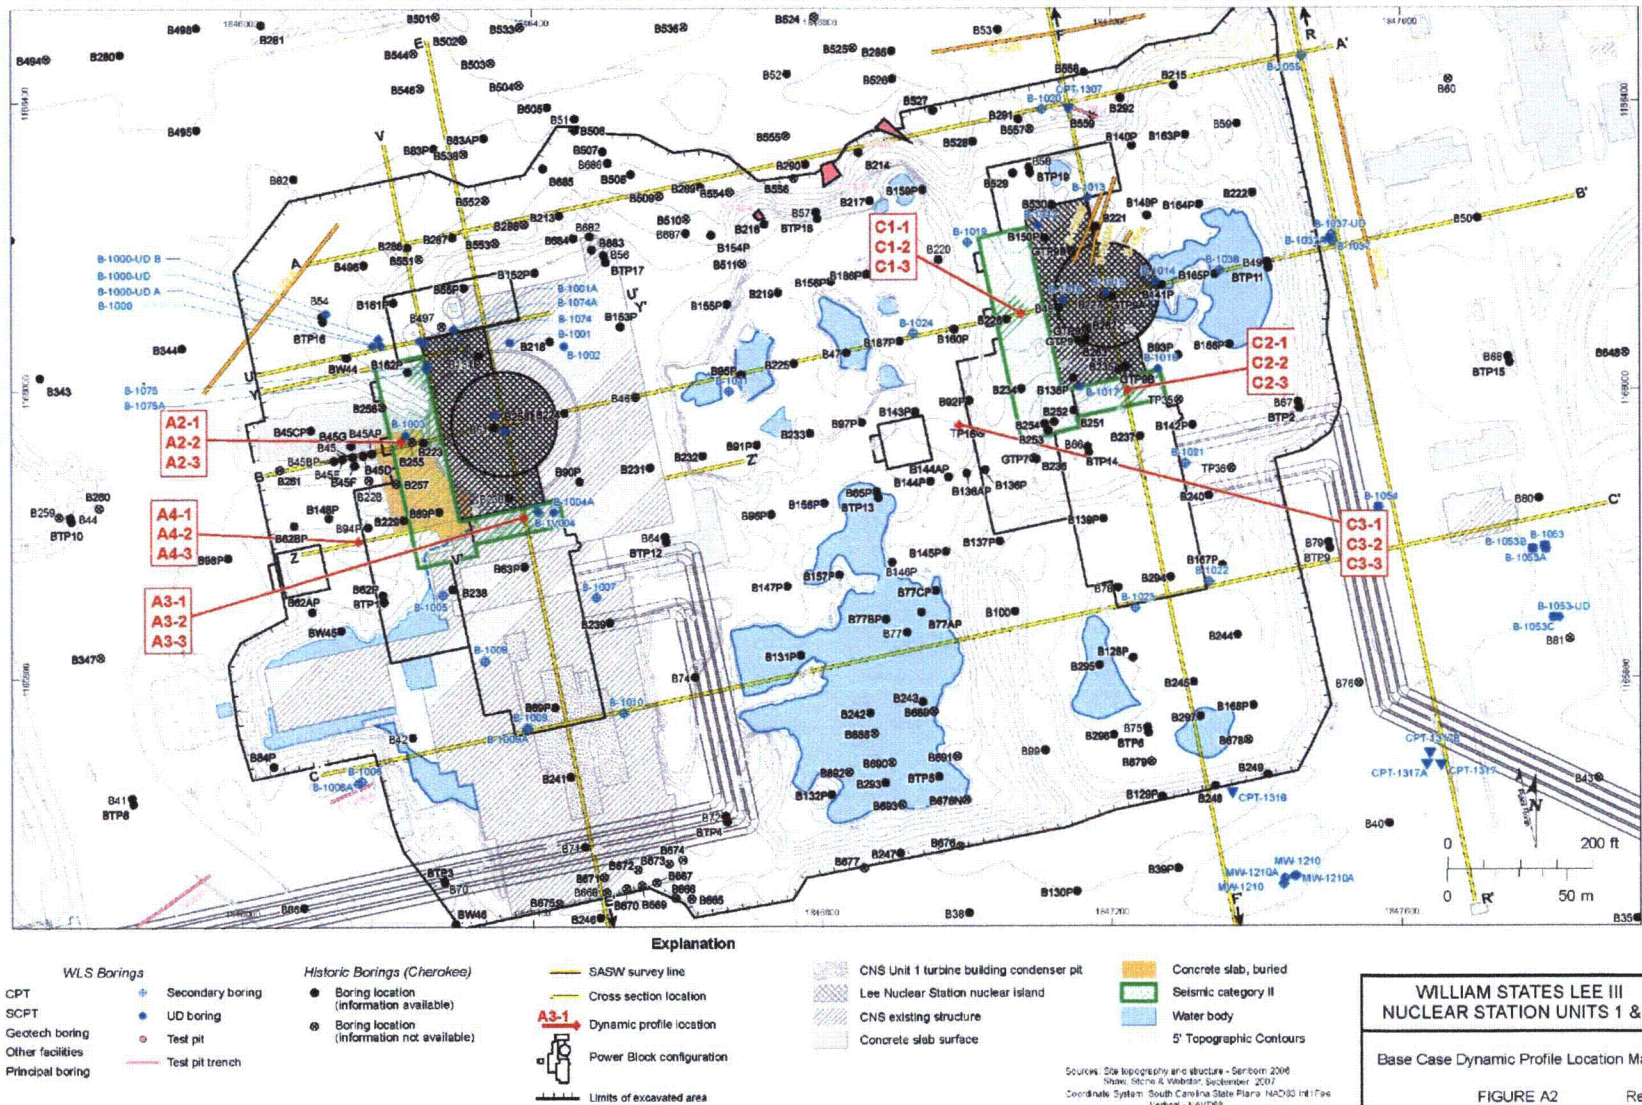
Duke Lee Site Plan – Units 1 and 2
